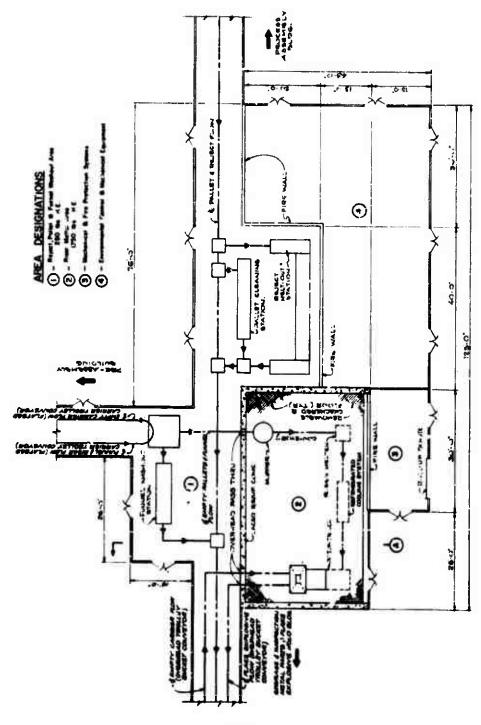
PACK -OUT BUILDING, BLDG. NO. 138
